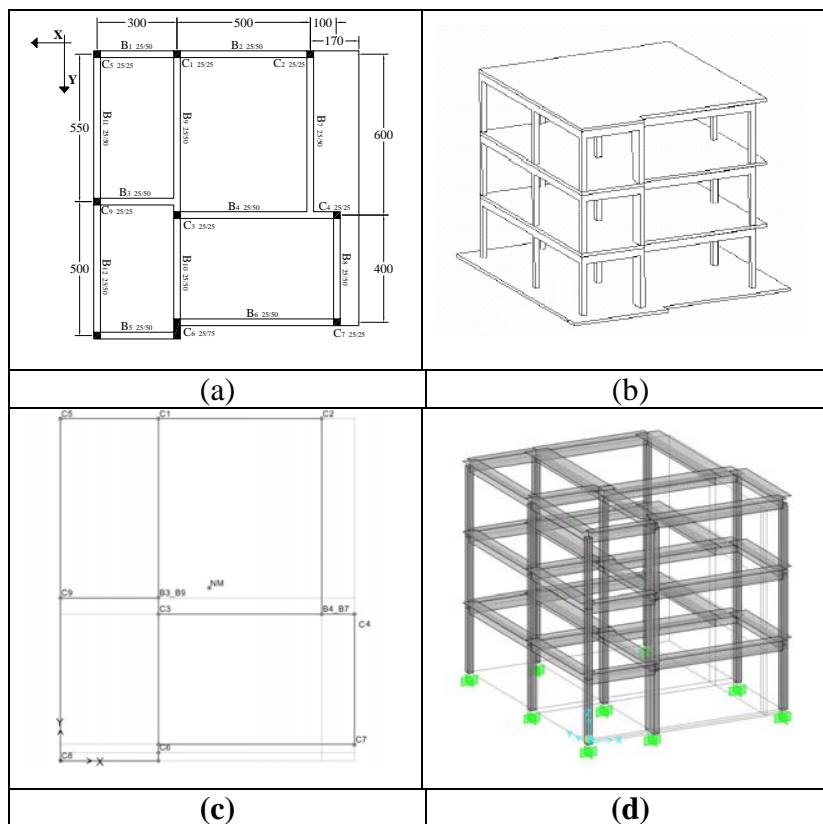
Plan (a) and 3D view (b) of the structure, plan model (c) and 3D model of the structure (d)
